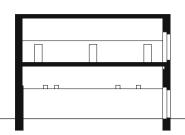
Ghorfa type A Longitudinal section, 1:200
